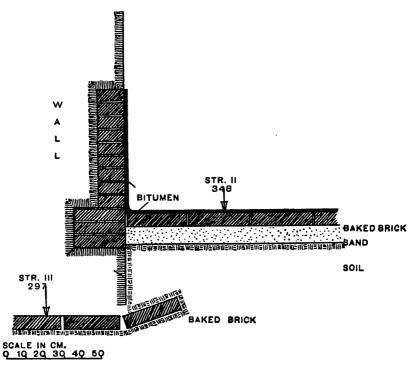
M100, Stratum II wall-facing and pavement, Stratum III pavement.
